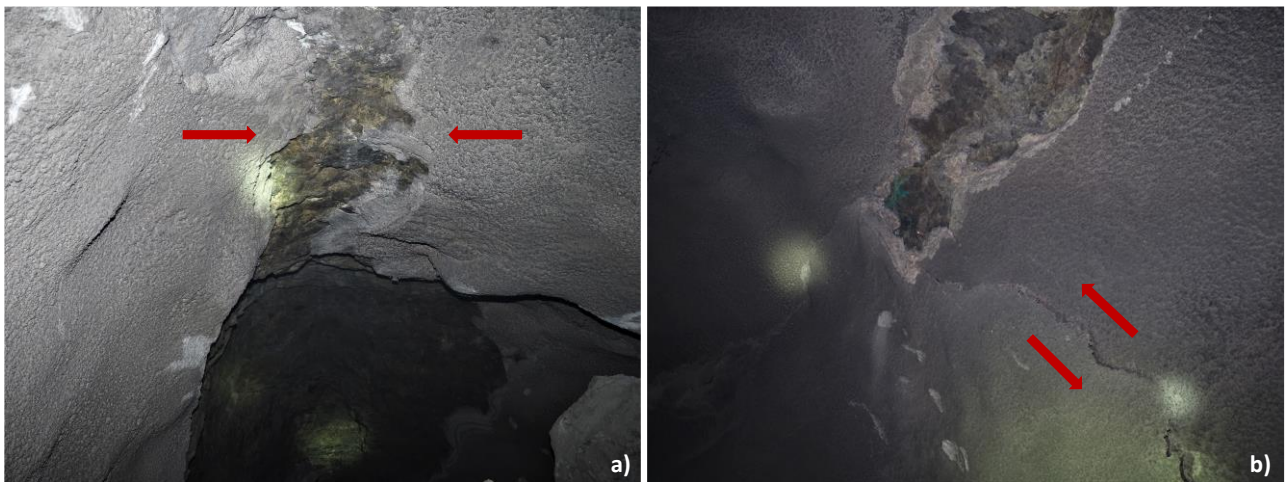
Examples of shotcrete failure a) compression and b) shear and punching
